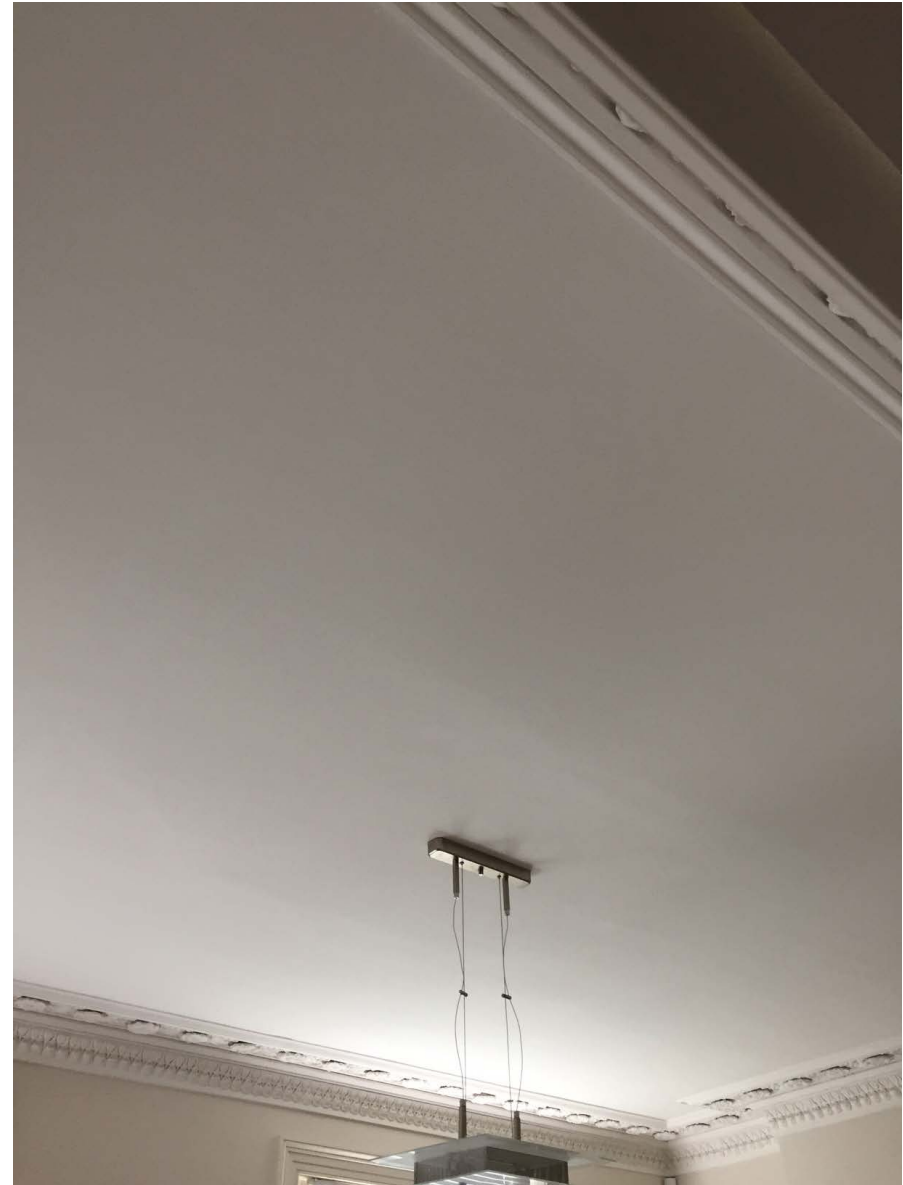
First Floor Bedroom 1, existing ceiling where ceiling rose should be.
